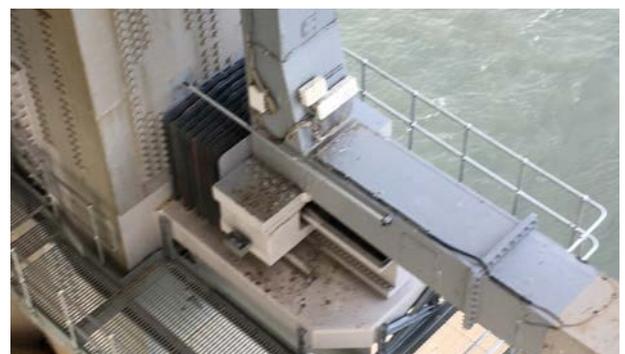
Completed solution, with new bearing installed and supporting the deck truss. One end of the bearing’s T-beam, at the tower, is enclosed in a protective expanding/contracting shroud
